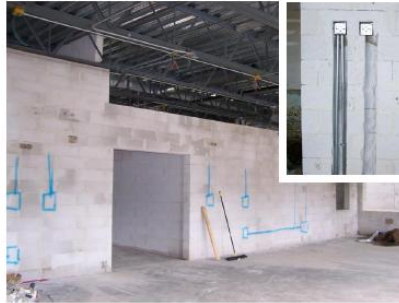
Electricians marked locations for their conduit and boxes on the AAC; bricklayers routed electrical chases into the AAC for recessed conduit and boxes (inset).
